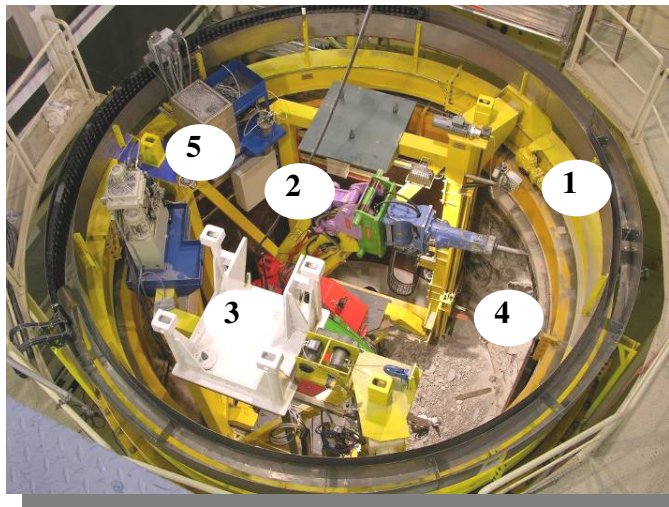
Tool carrier system: RC jack hammer (excavator), an industrial product with a few modifications: supports (instead of chains, 1), adapter for tool uptake (2)
